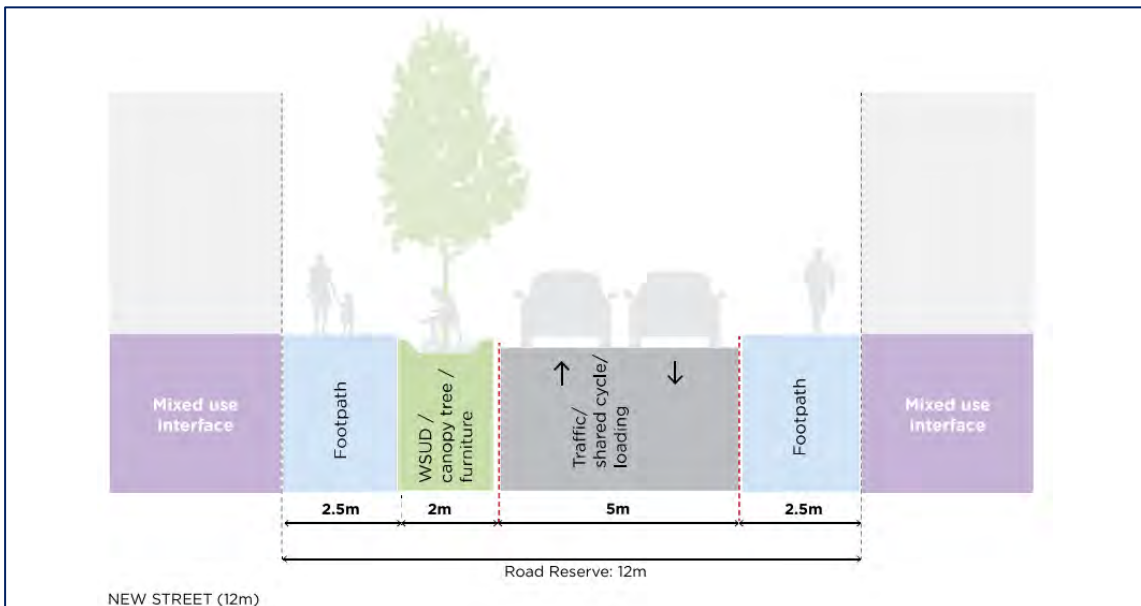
Proposed 12m Cross Section - Macaulay - Stubbs and Boundary Precincts
